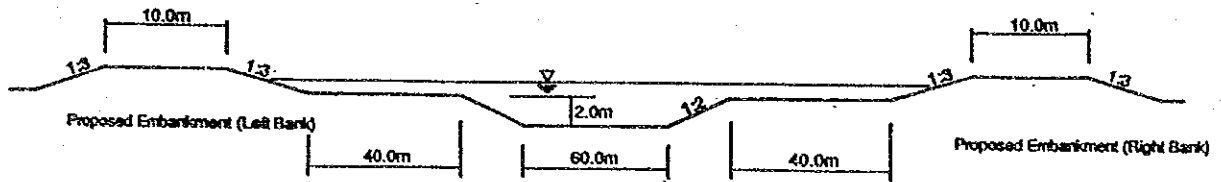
DESIGN LONGITUDINAL SECTION OF THE RIO BLANCO (ALTERNATIVE 1)
